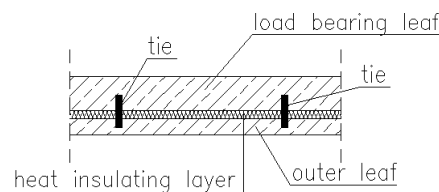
Diagram of three-leaf walls of large panel buildings.
